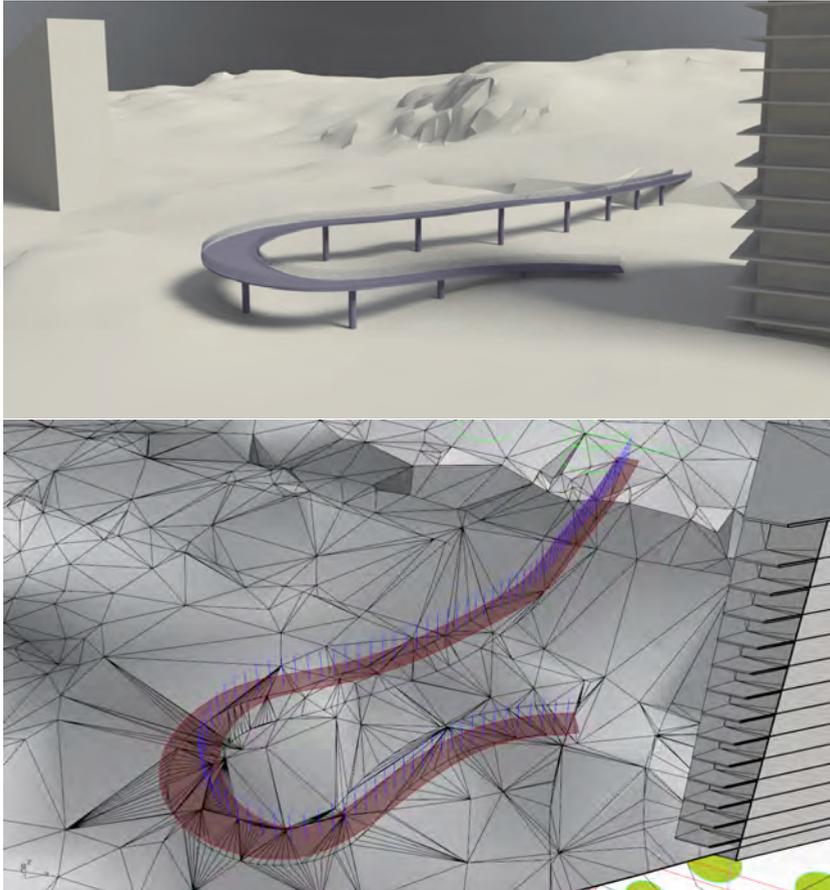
The initial pedestrian bridge scheme - a simple concrete path.
